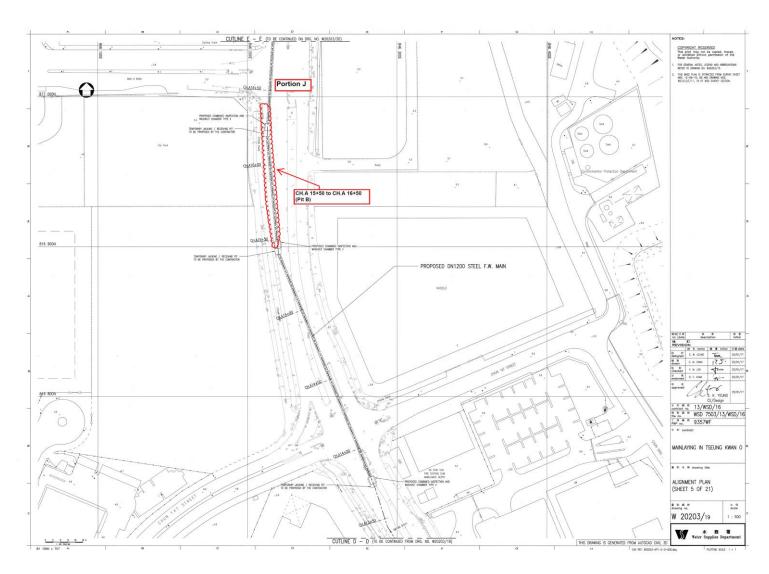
Location Plan for Portion J – CH. A15+50 to CH.A 16+50 (Pit B)
